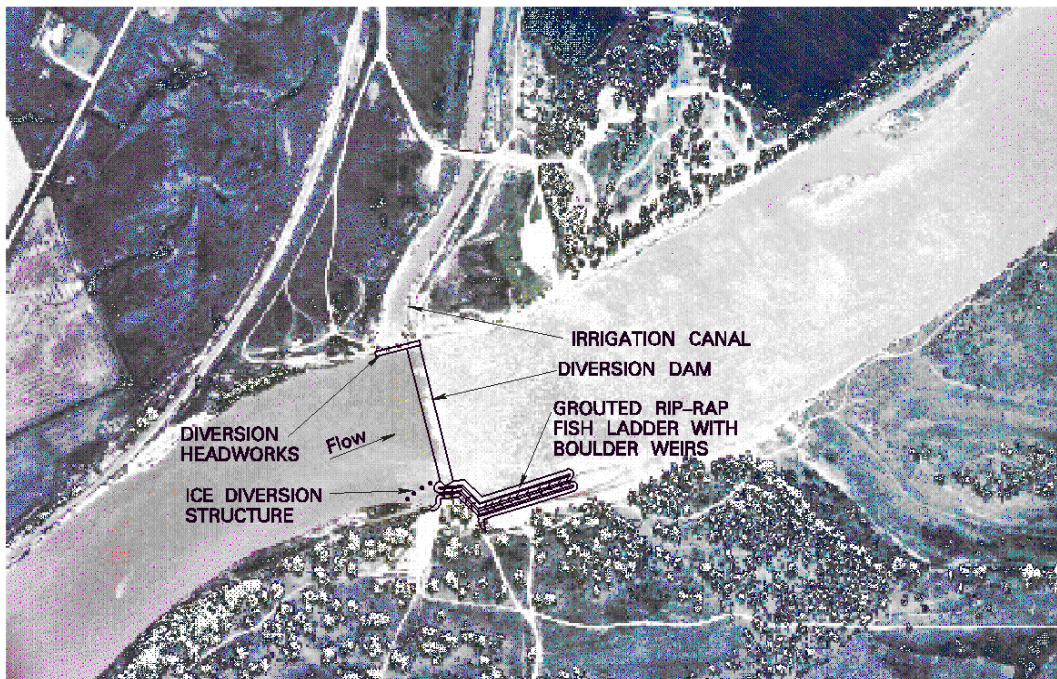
Plan View of Grouted Riprap Fish Ladder with Boulder Weirs
